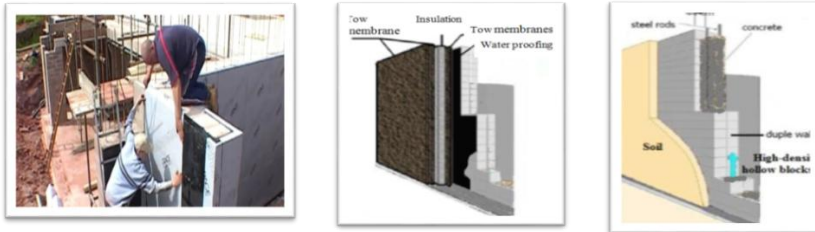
images show the insulation of waterproofing and its layers used in walls.
